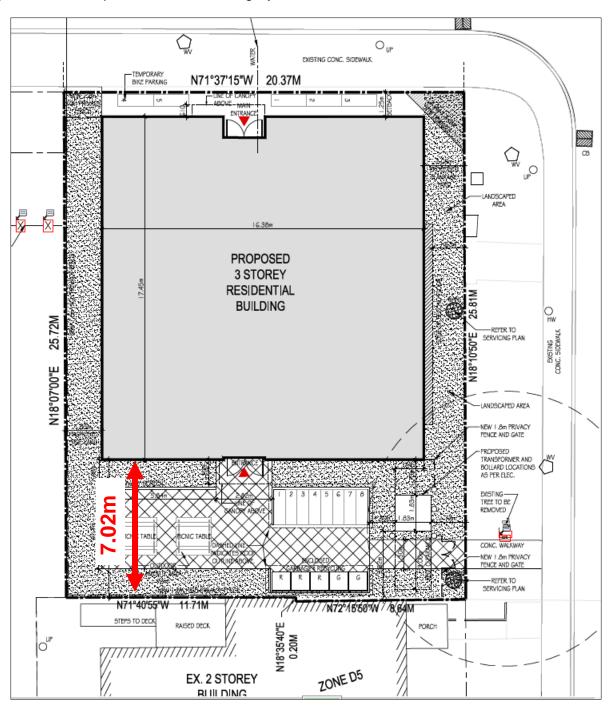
Proposed Site Plan Source: Cynthia Zahoruk Architects 2020
